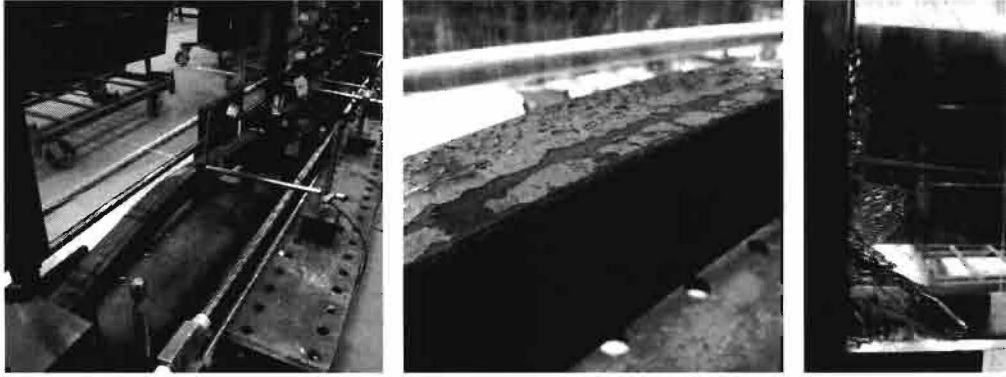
(L) Buckling of the steel column section of specimen 1 occurred at midspan of the unsupported length closest to the load introduction.
